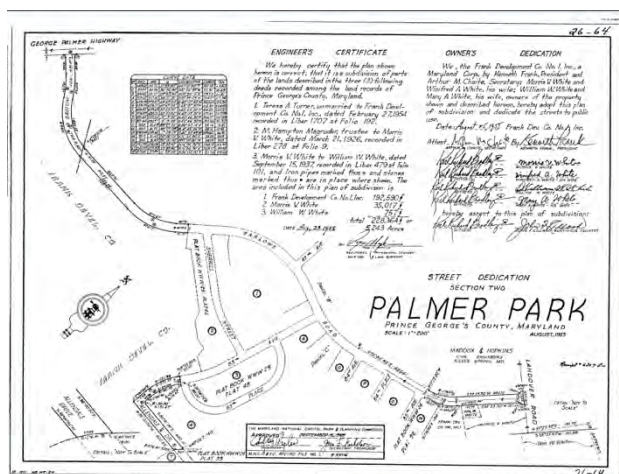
Maddox & Hopkins, "Palmer Park, Section 2. Street Dedication- 1955."
